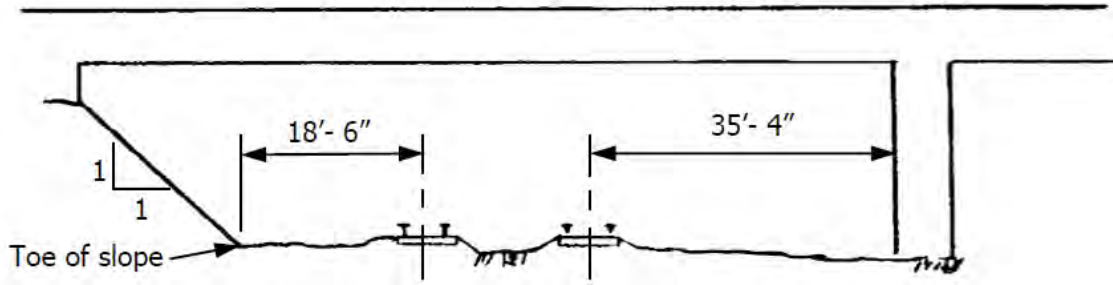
Bridge elevation view with two railroad tracks that both carry freight below the bridge (Example 2)
